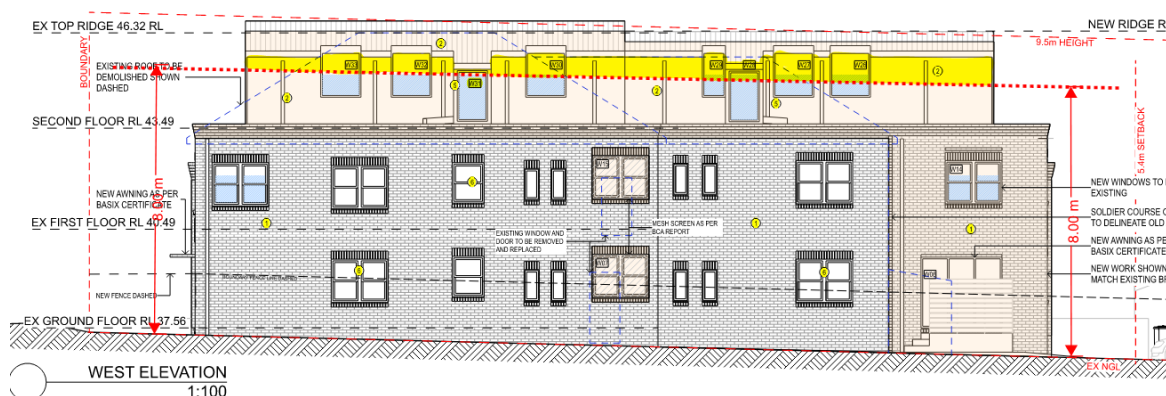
Western Elevation showing highlighted area of non compliant external wall height
